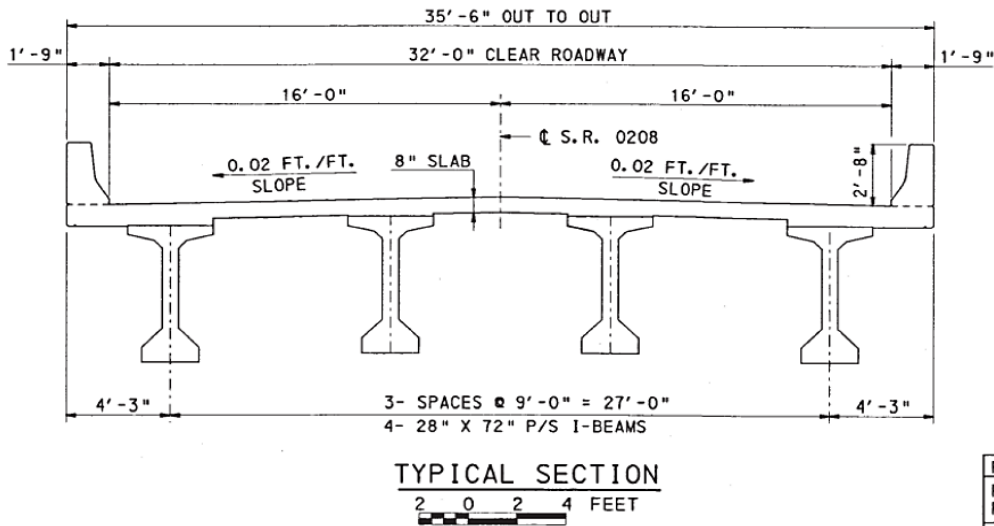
As-Built Plan (Typical Cross Section View) Bridge No. 22266
